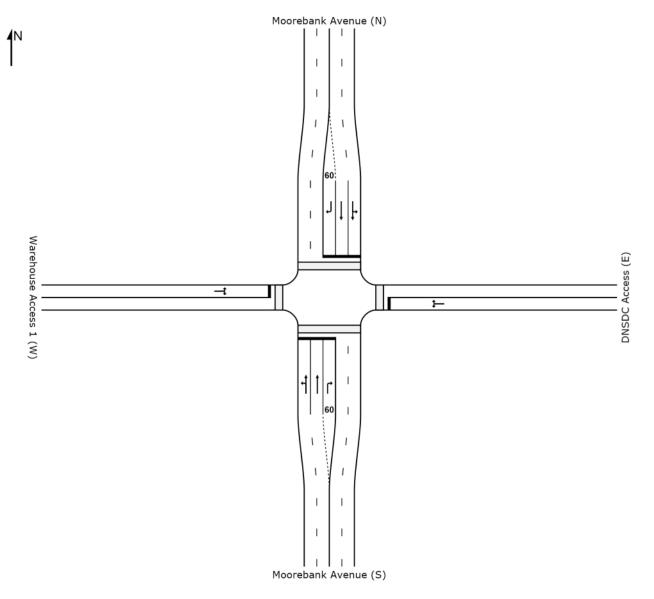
Proposed Moorebank Avenue and Warehouse Access 1 intersection
